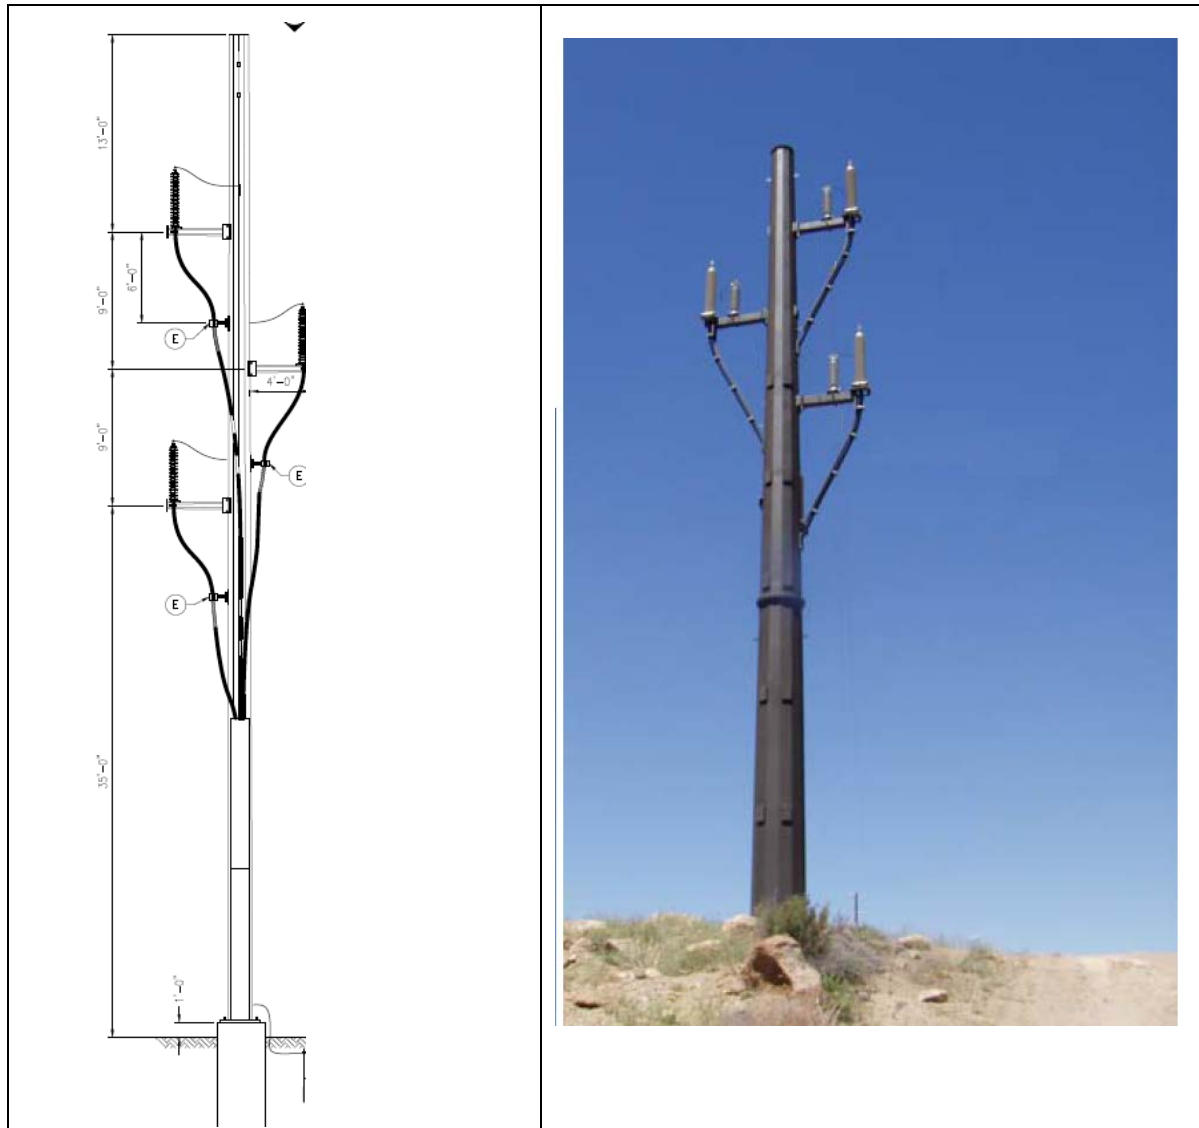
Actual Installation of Cables and Joints in Straight through Arrangement
